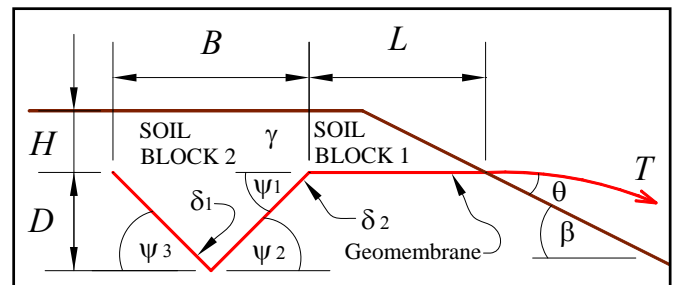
Geometry of V-shaped anchor trench. (After Villard and Chareyre, 2004)
